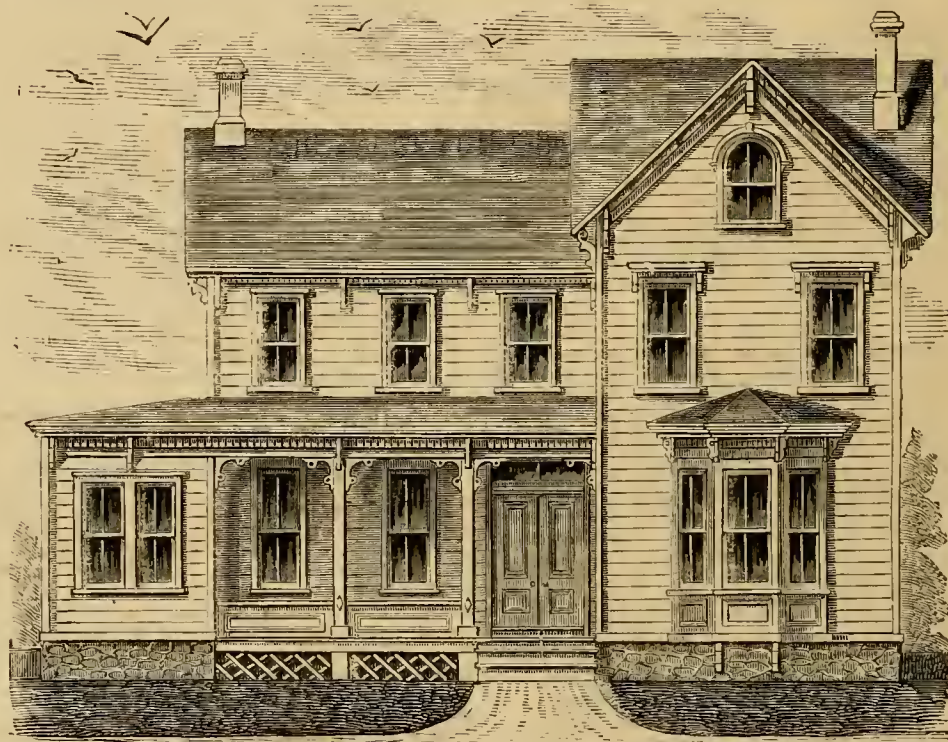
FRONT ELEVATION OF FARM HOUSE.
